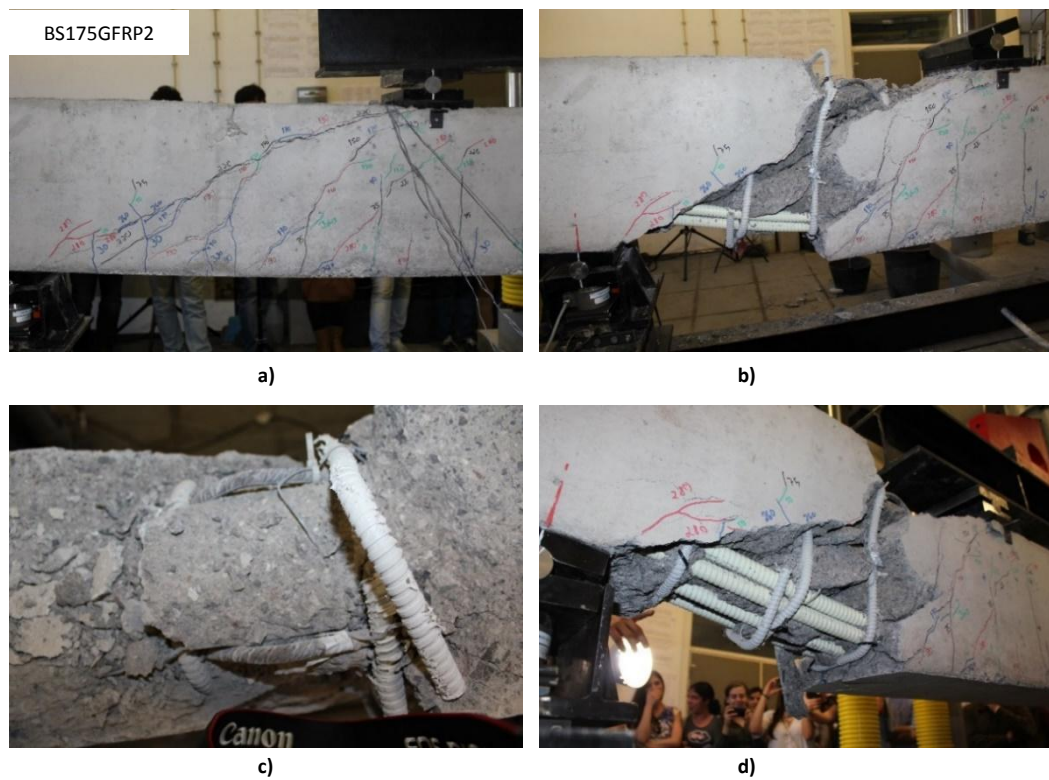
BS175GFRP2 failure: a) shear-span before failure; b) shear-span after failure; c) concrete crushing over the loading point; d) stirrups disintegrated at bottom
